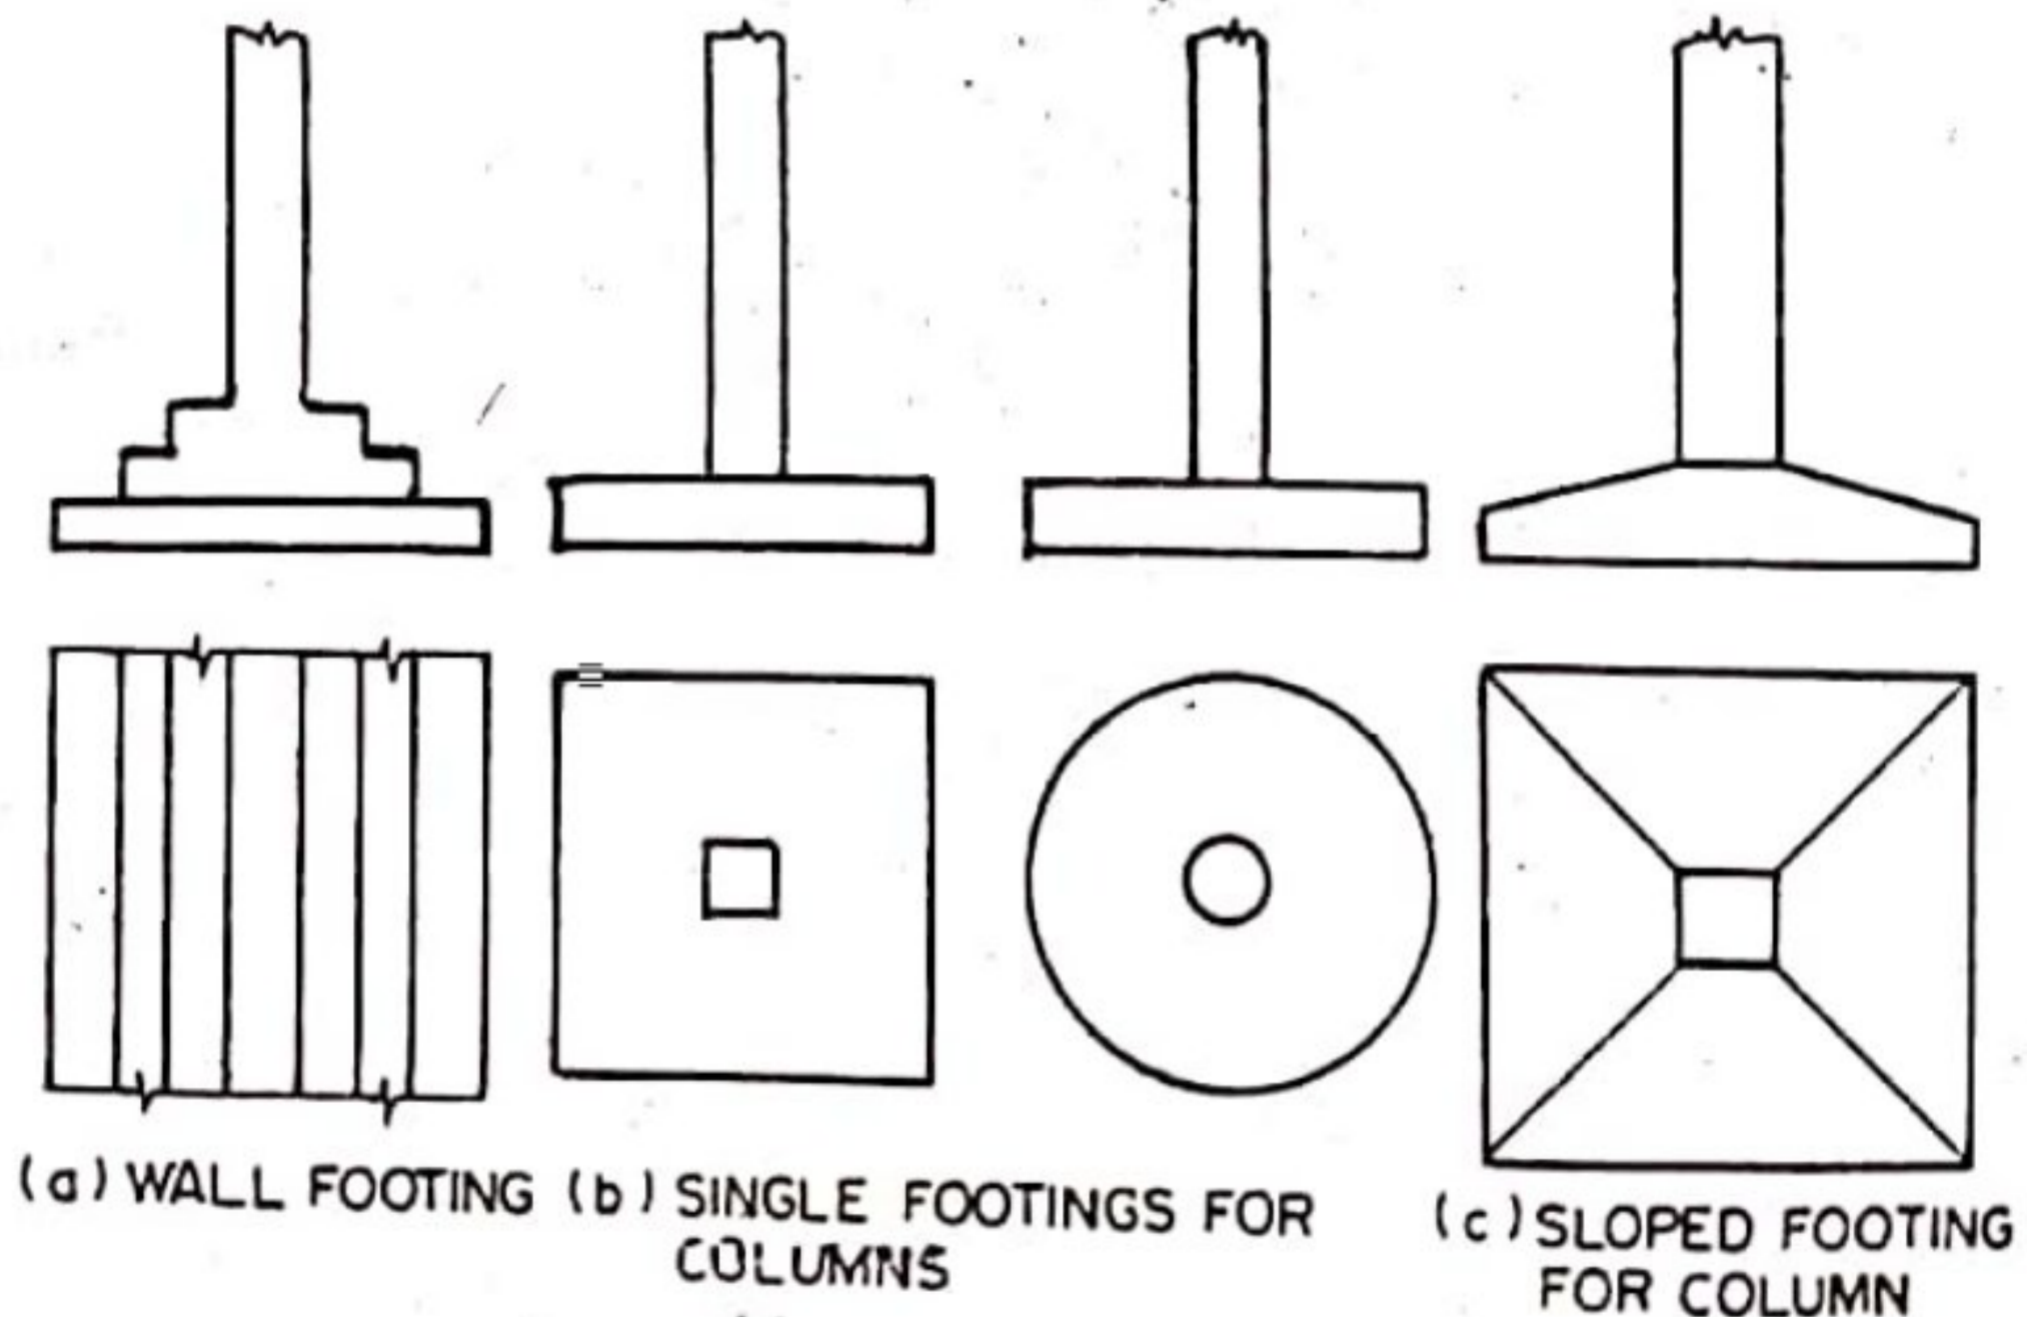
TYPICAL SPREAD FOOTINGS.
